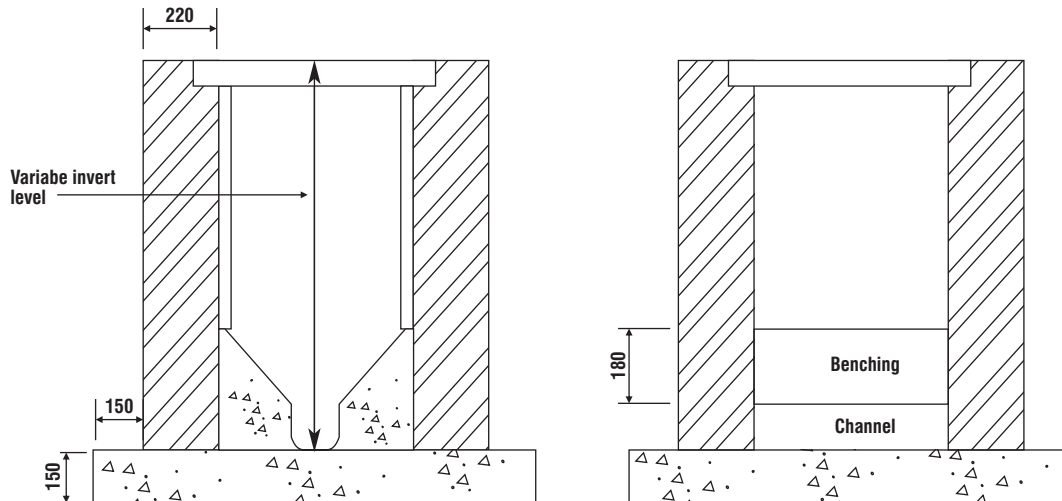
VERTICAL SECTIONS THROUGH MANHOLE
